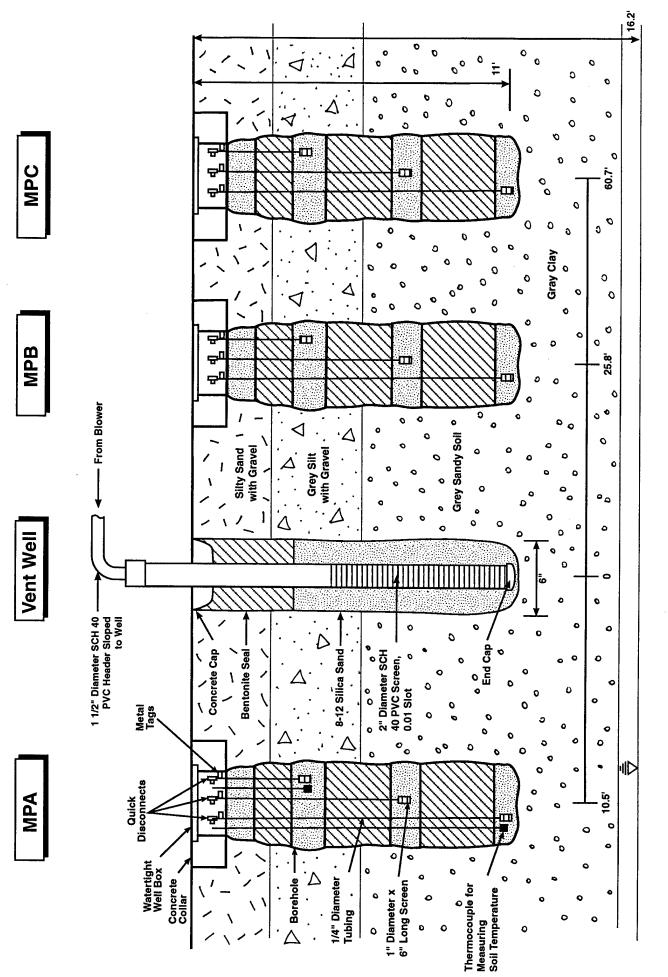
Cross Section of Vent Well and Monitoring Points at the Saddle Tank Farm Site Showing Site Lithology and Construction Detail (not to scale)
